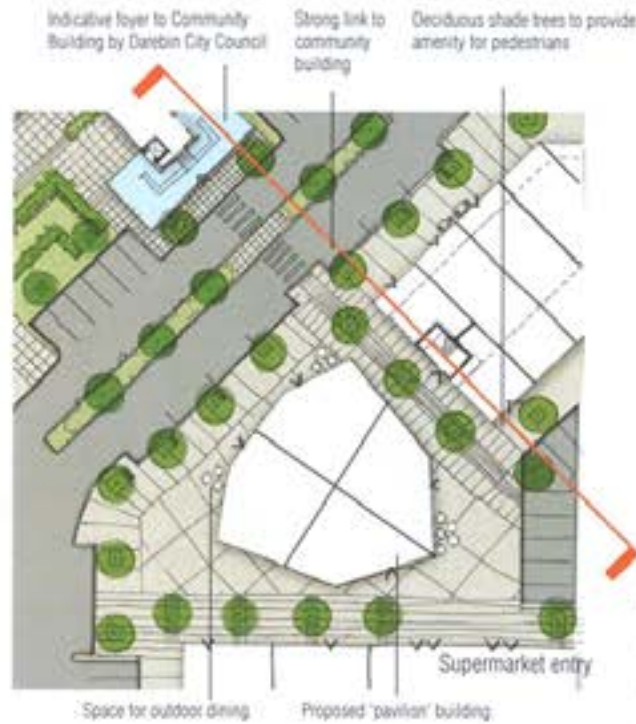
Indicative Plan of Main Street Civic Plaza (Source: HASSELL, 2008)
